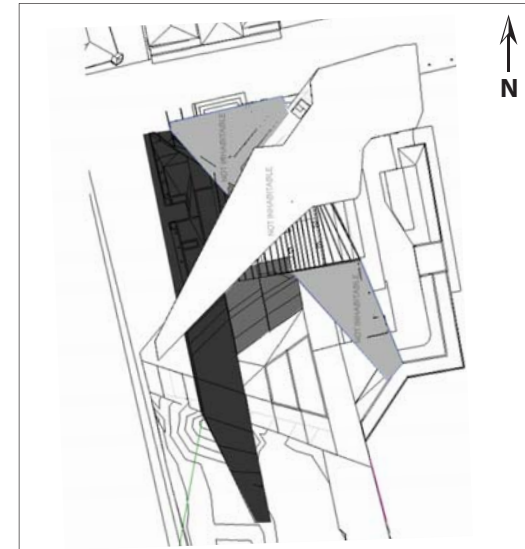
Hierarchy of roof planes. The darkest roof plane being the roof terrace that is inhabitable and is accessed from Queens Wharf and Frank Kitts Park
